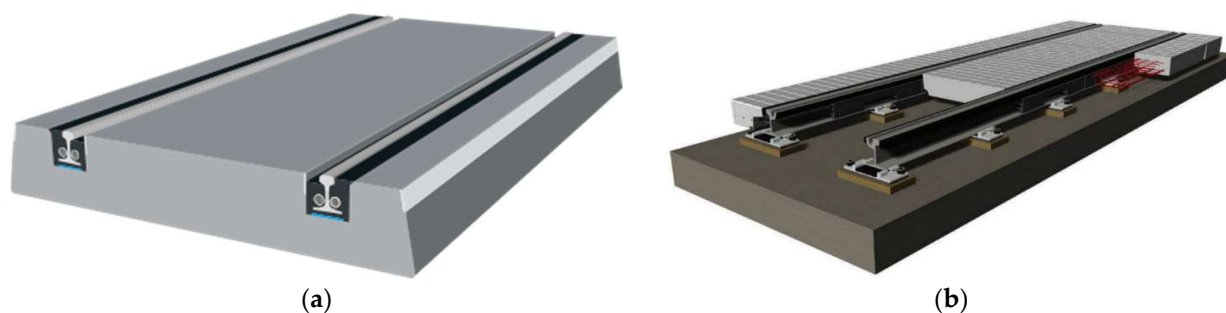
Tracks with (a) continuously fastened rails (embedded rail) and (b) with discretely fastened rails.
